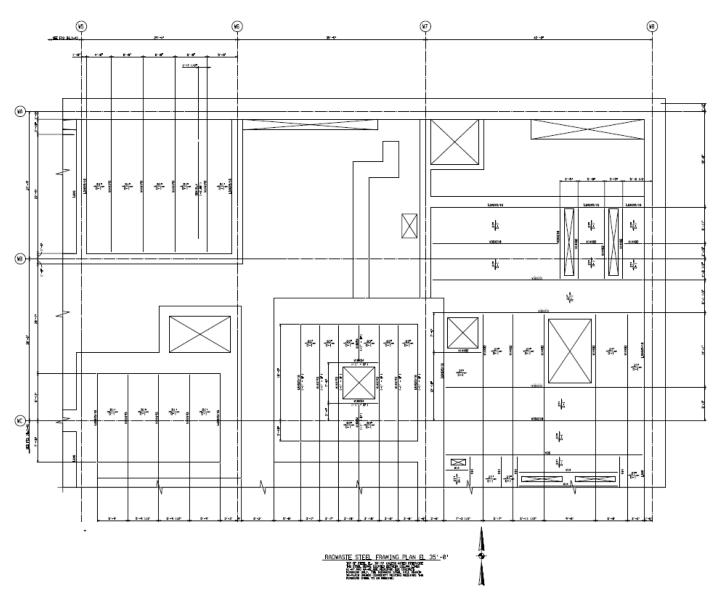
H.3-44 El 35'-0" Steel Layout Between Column Lines W5-W8 and WA-WC
